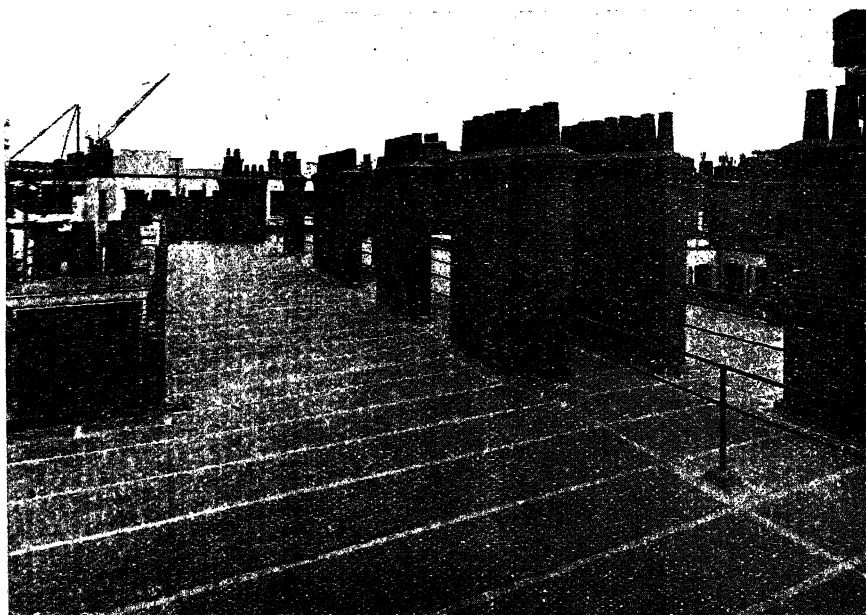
CHIMNEYS SHOWING POTS AND PROPERLY FLAUNCHED TOPS. THE FLAT ROOF IS COVERED WITH BUILT-UP RUBEROID ROOFING (*The Ruberoid Co., Ltd.*)
